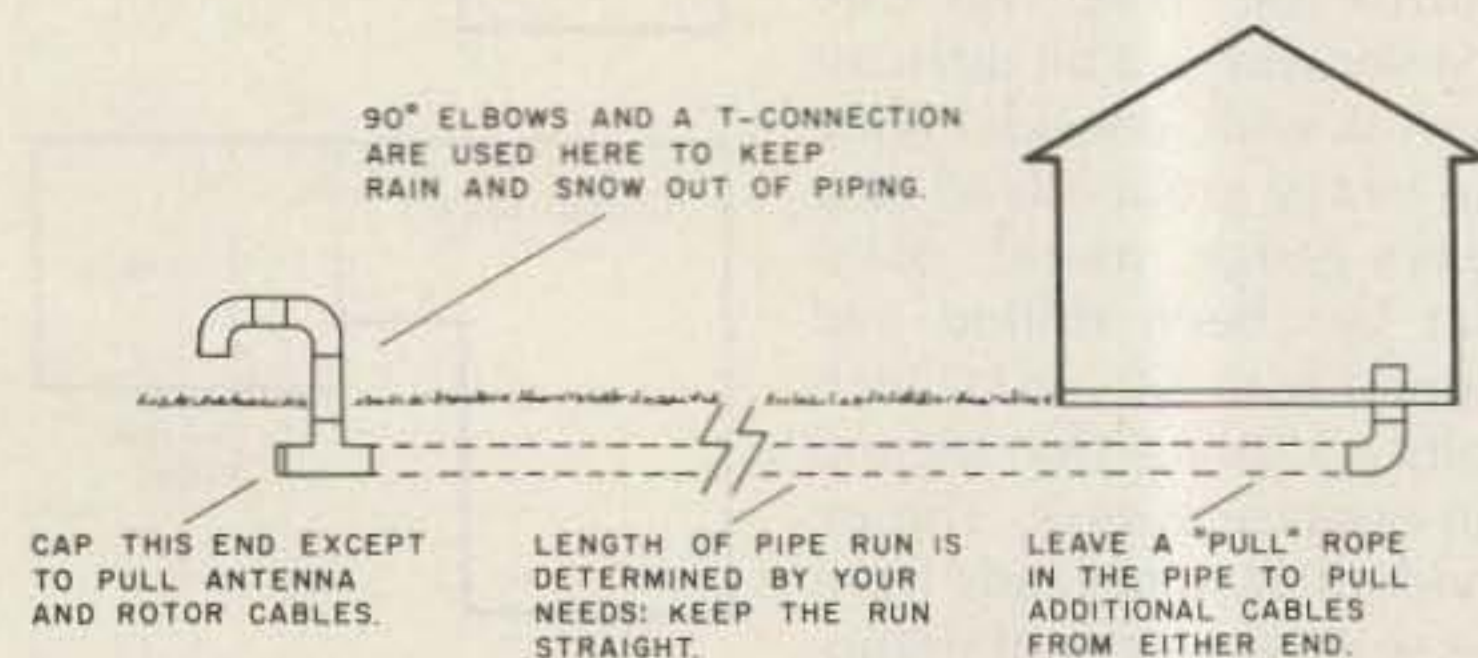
Details of PVC pipe arrangement which contains coax and control cables
